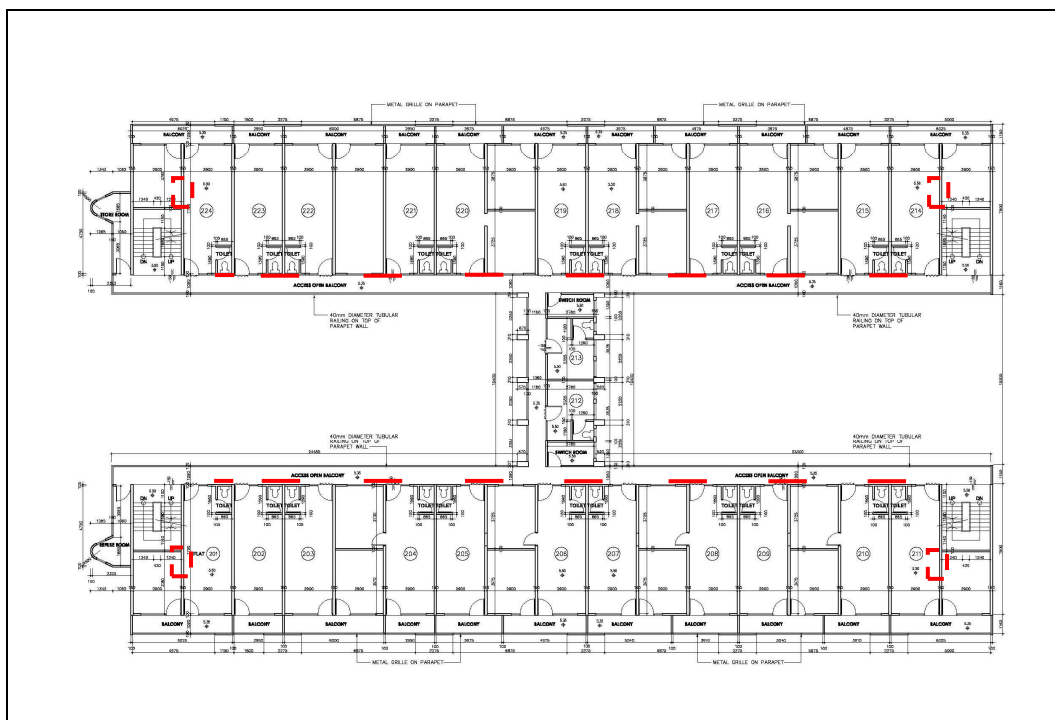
Existing first floor plan (new openings to be formed in the internal cross walls boxed in red, and pipe duct lined in red)
